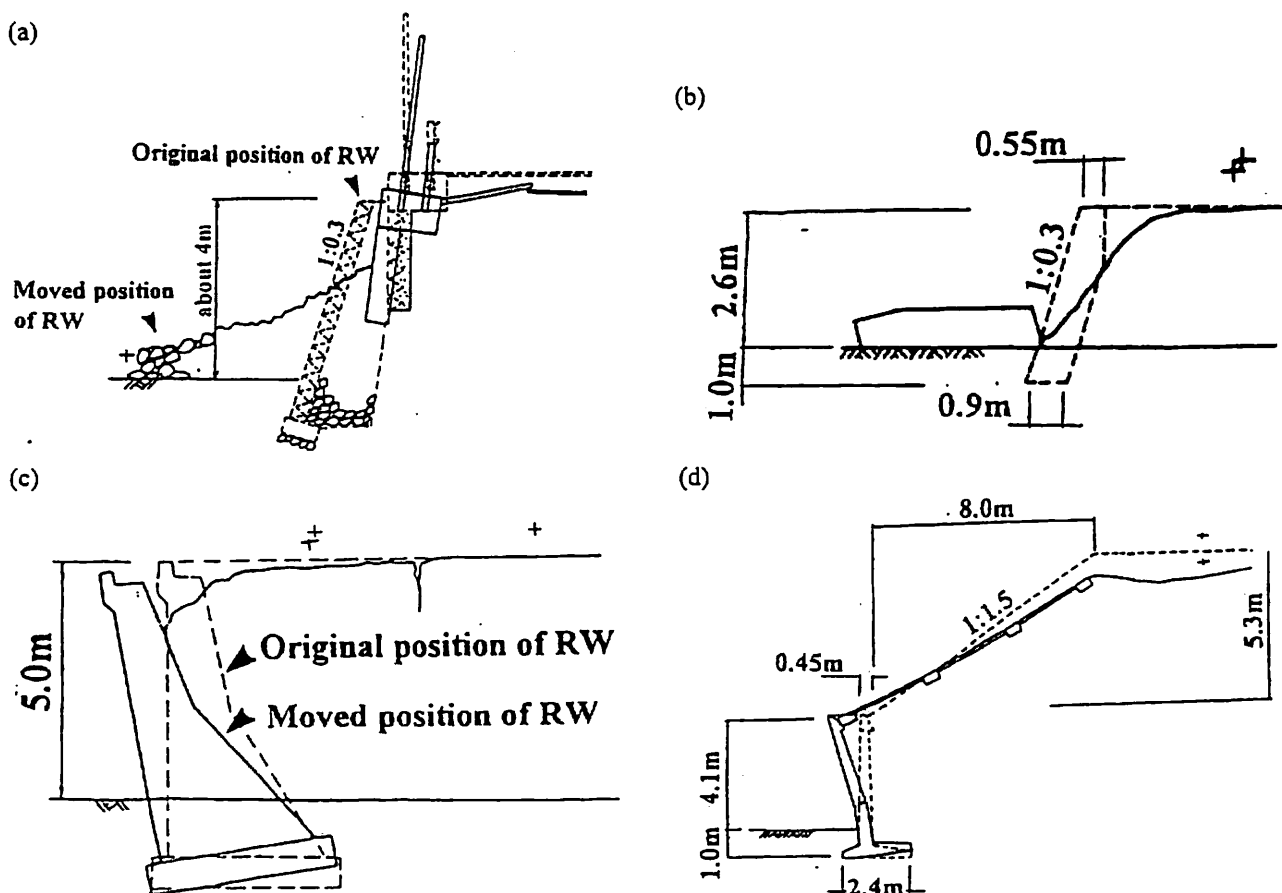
Cross-sections before and after the earthquake of seriously damaged or totally collapsed RWs; a) a masonry RW between Setsu-motoyama and Sumiyoshi Stations; b) a leaning-type RW between Setsu-motoyama and Sumiyoshi Stations; c) a gravity-type RW at Ishiyagawa Station; and d) a poorly designed old cantilever RC RW at Shin-nagata Station
